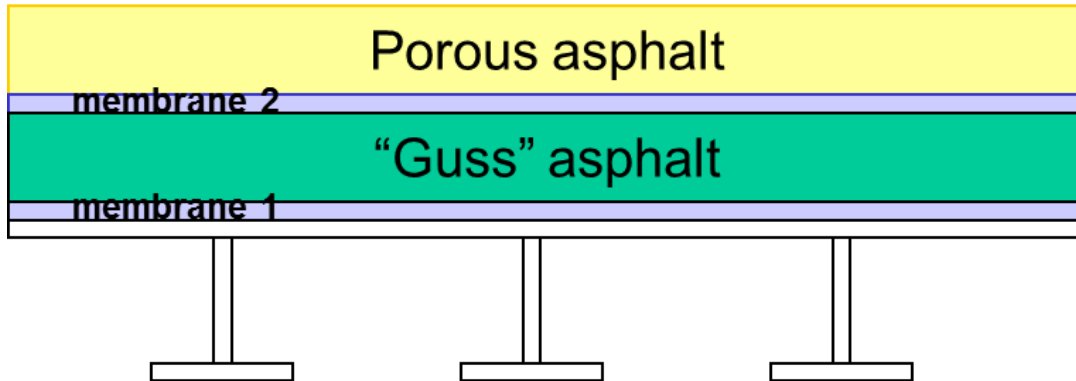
Schematic of a typical Dutch asphalt surfacing system on a steel bridge
